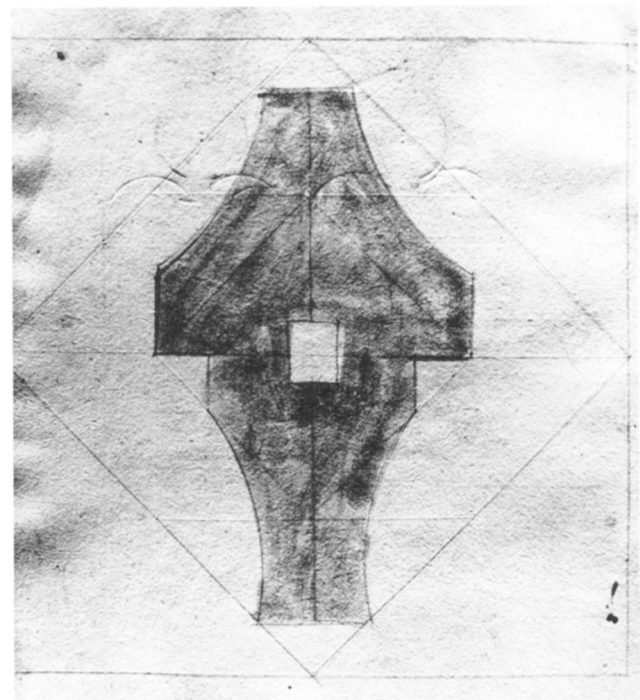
Construction of a window mullion (Frankfurt, Stadel).
